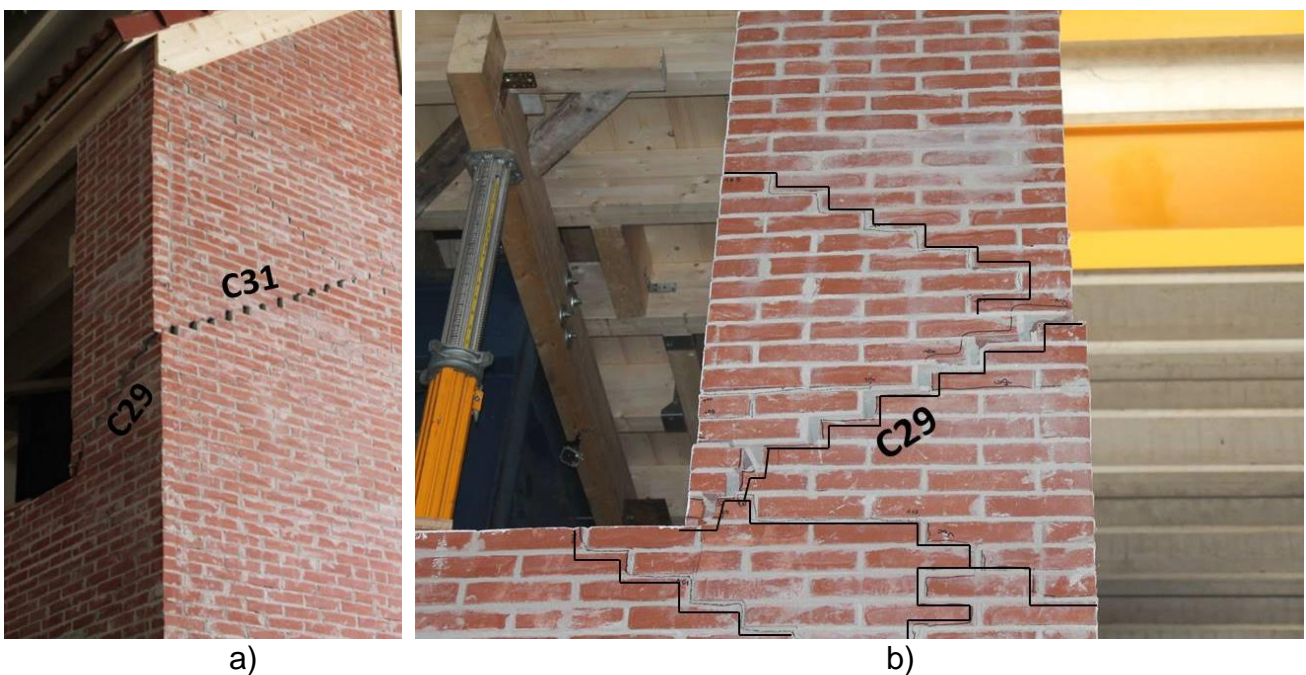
EQ-NPR IS 133% cracks: a) C29, C31 overview; b) C29 zoom in.
